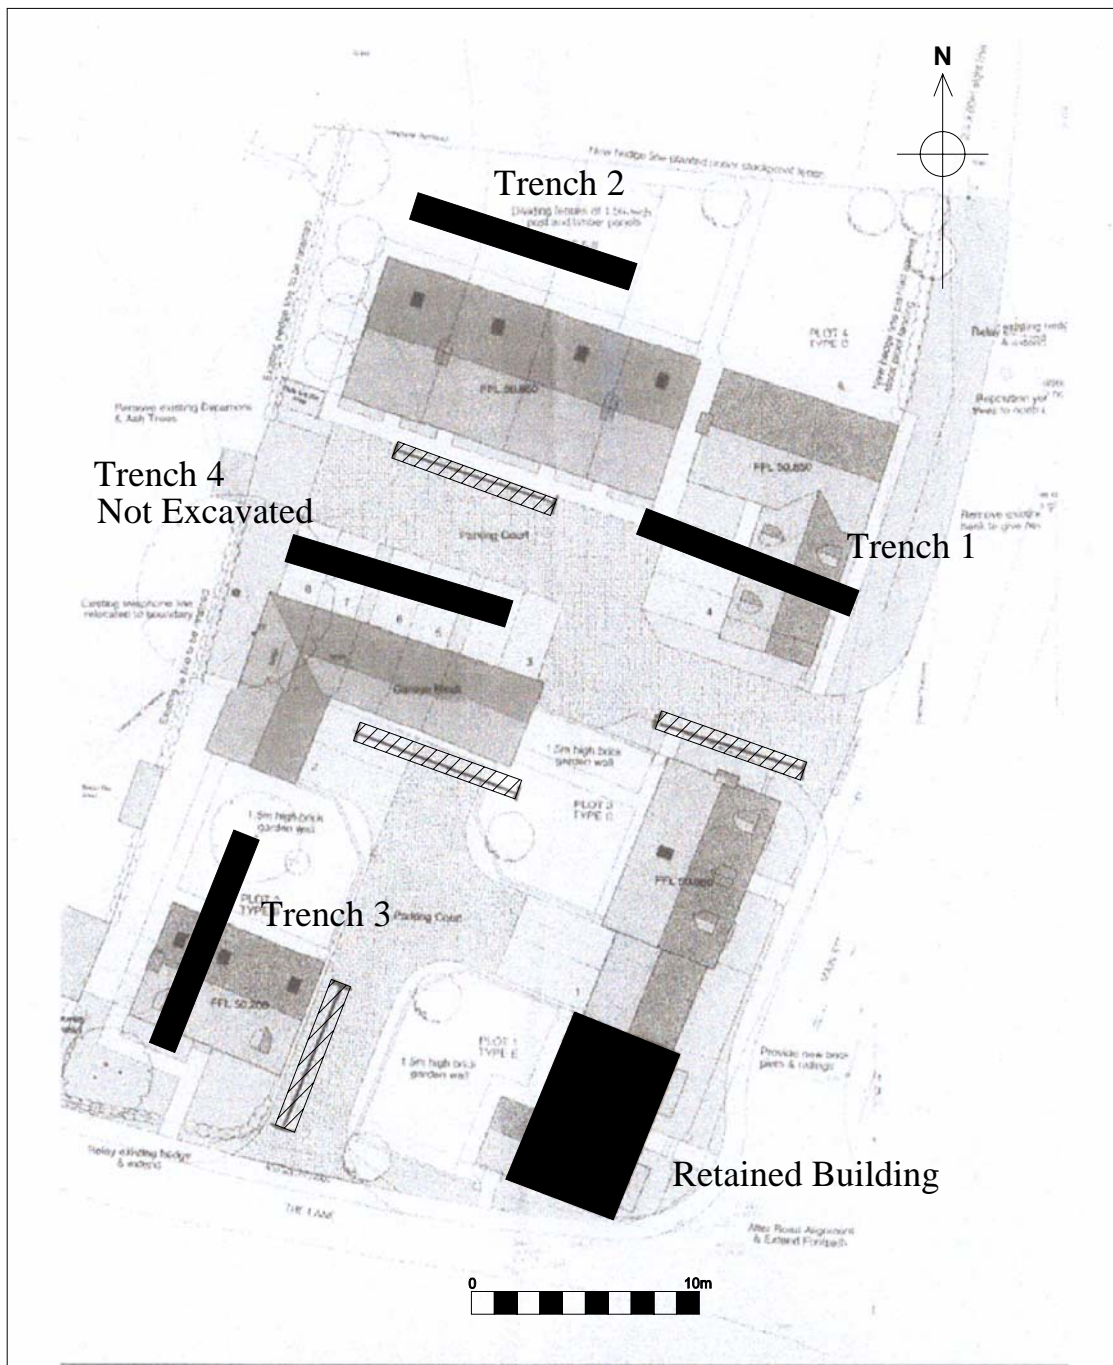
Trench Location Plan Proposed & Actual in Bold.
